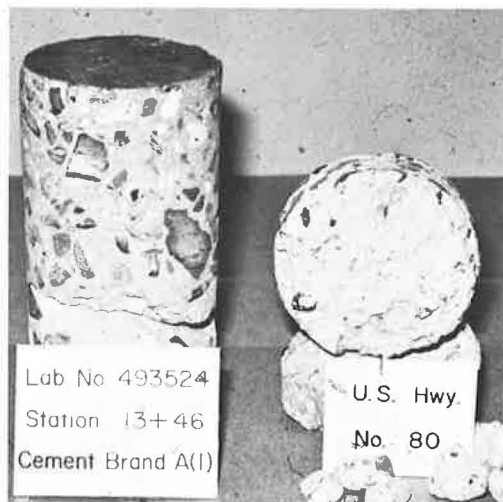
Two cores drilled from concrete pavement on US 80, project UI-251(7); concrete in both cores made from Brand A(1) cement.
